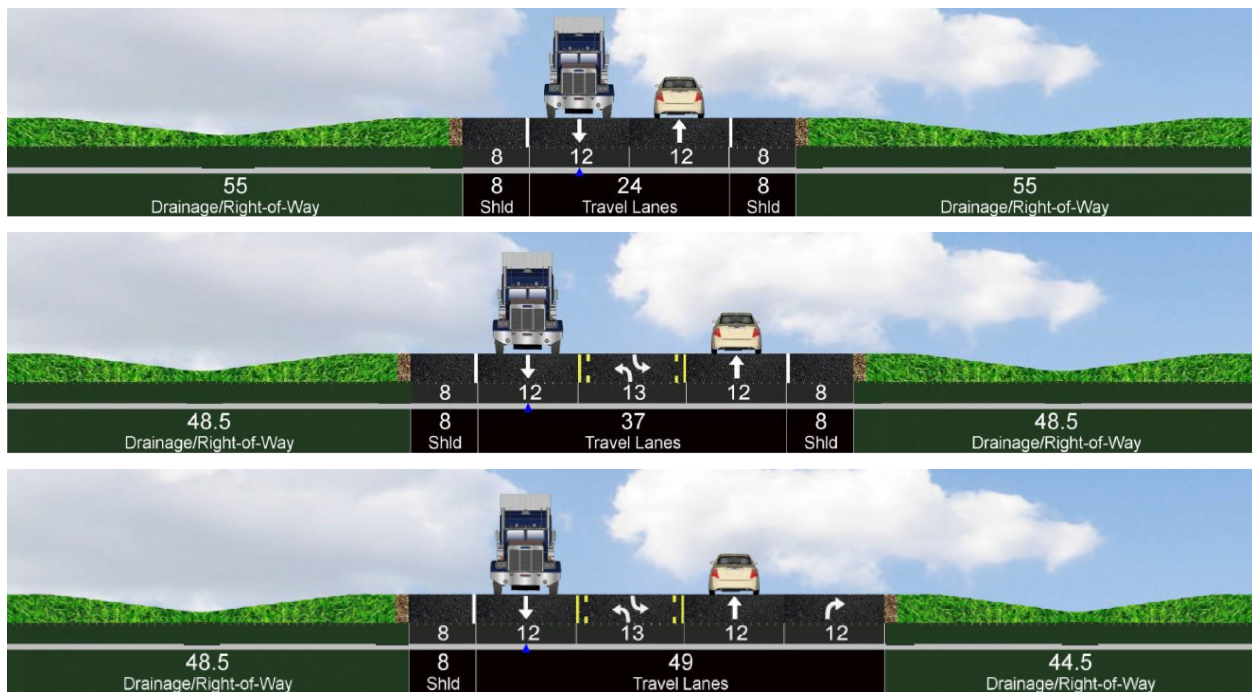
3. Roadway Typical Section Comparison – 23rd Street NW to 140th Street SW
